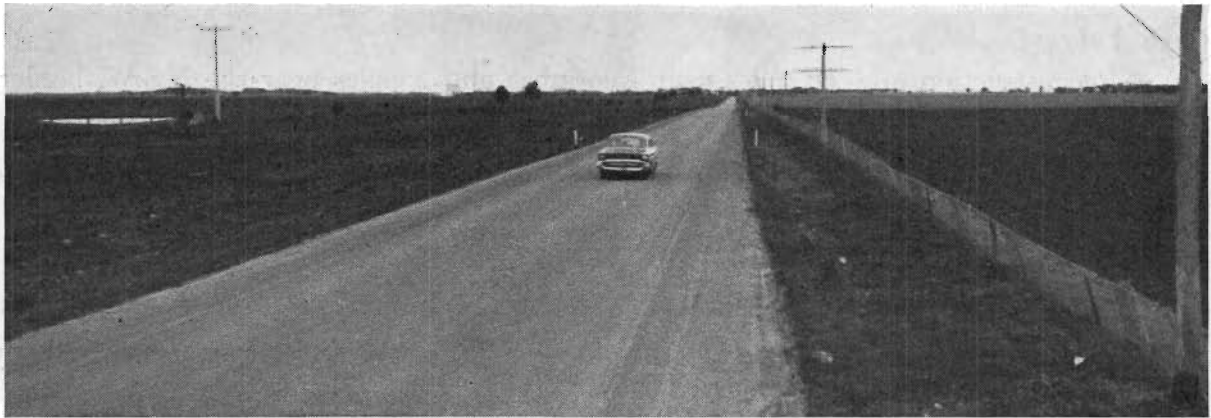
Henty Highway Section 3. Reconstructed and sealed section north of junction with Wimmera Highway, near Horsham.
